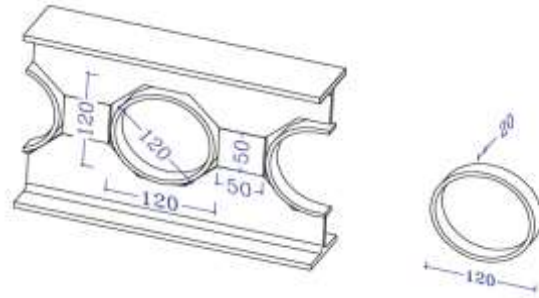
Stiffeners Made of Ring Steel for Octagonal Castellated Beams [61]
